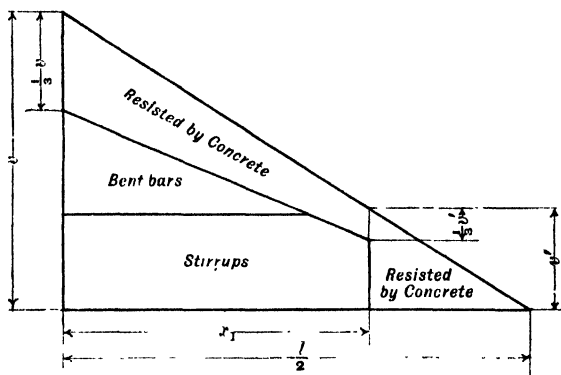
Spacing of Stirrups and Bent Bars for Uniform Loading. (See p. 528.)
